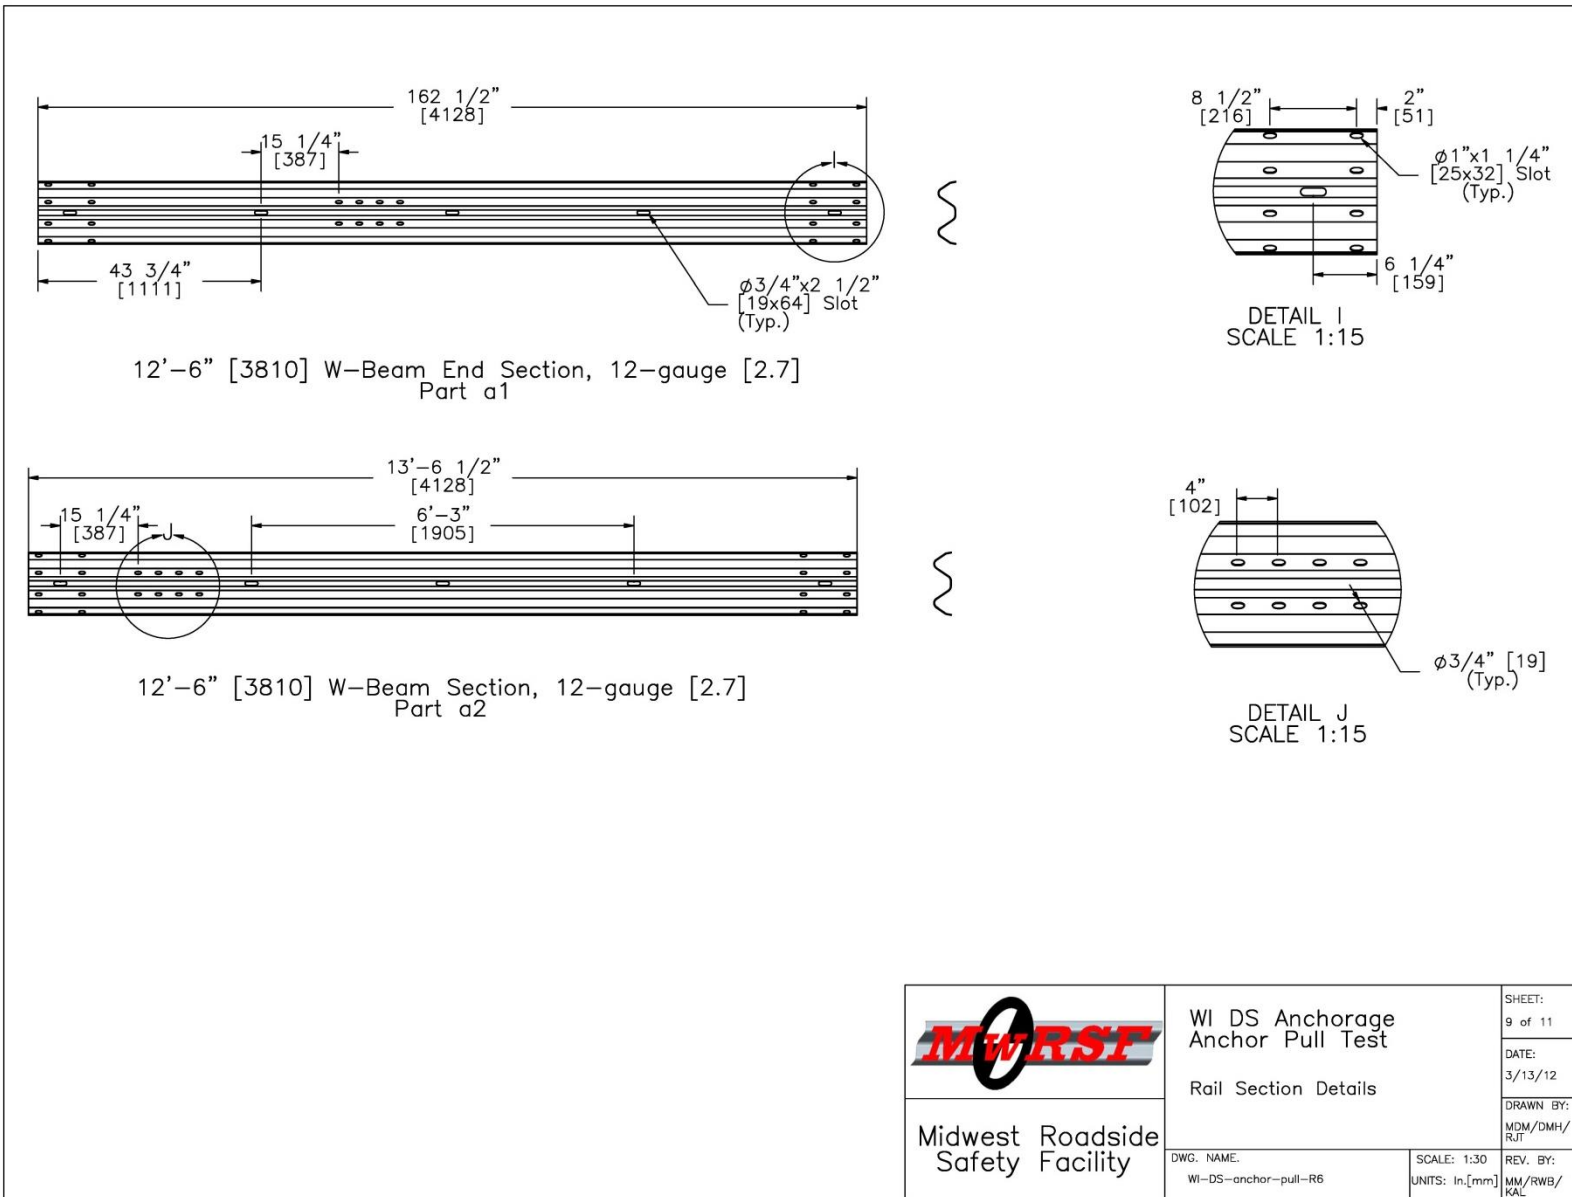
Rail Section Details, Test Nos. DSAP-1 and DSAP-2
